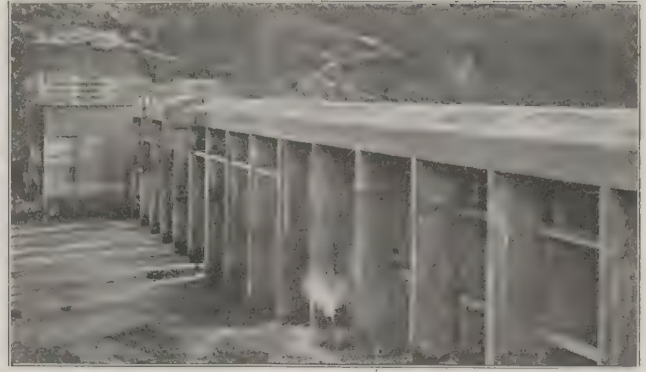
DOWN-STREAM SIDE OF POWER HOUSE AND EAST SECTION OF DAM DURING CONSTRUCTION, SHOWING PASSAGWAY THROUGH DAM.
